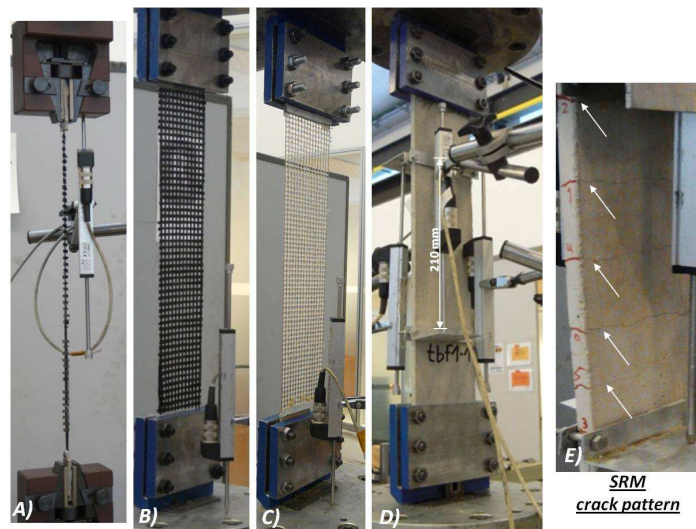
Tensile test lay out: A) basalt roving; B) basalt textile; C) steel strip; D) SRM/BRM; E) detail.
